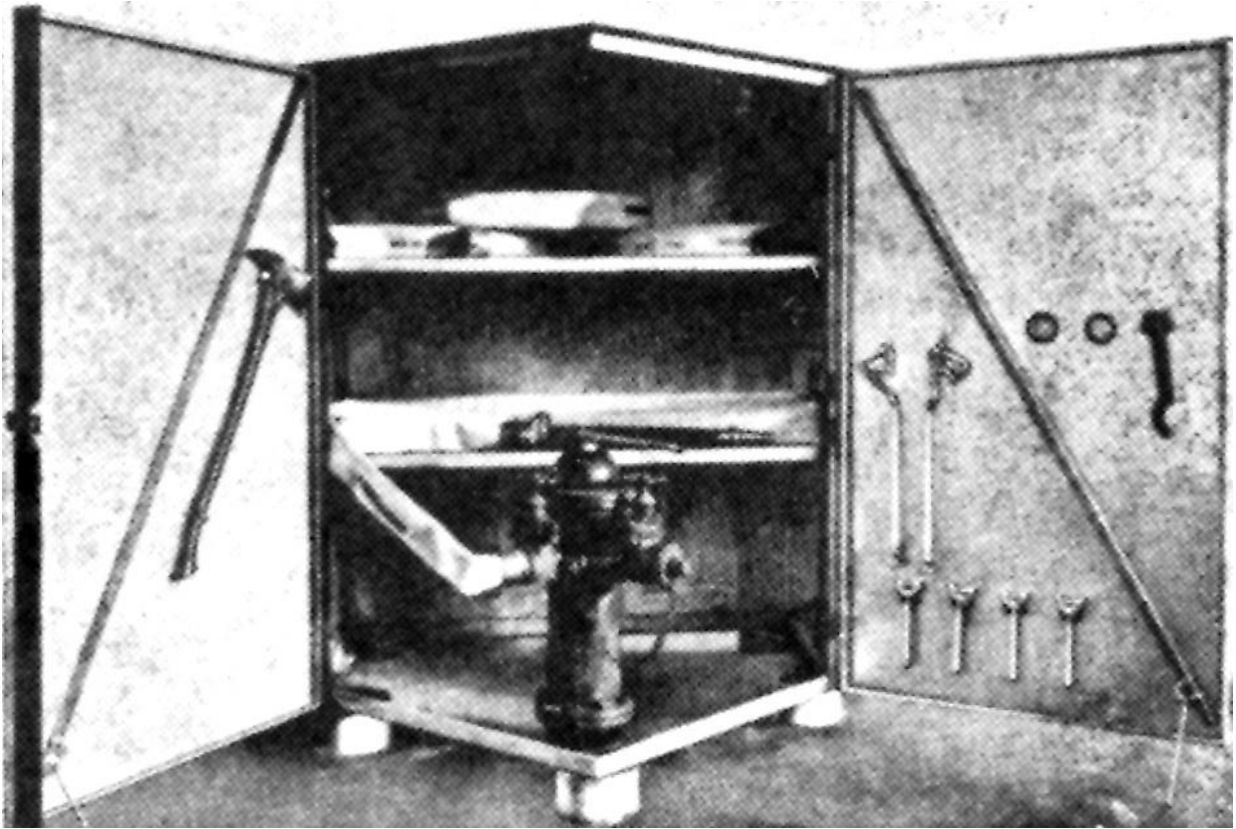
(a) Hose House of Five-Sided Design for Installation over Private Hydrant.
